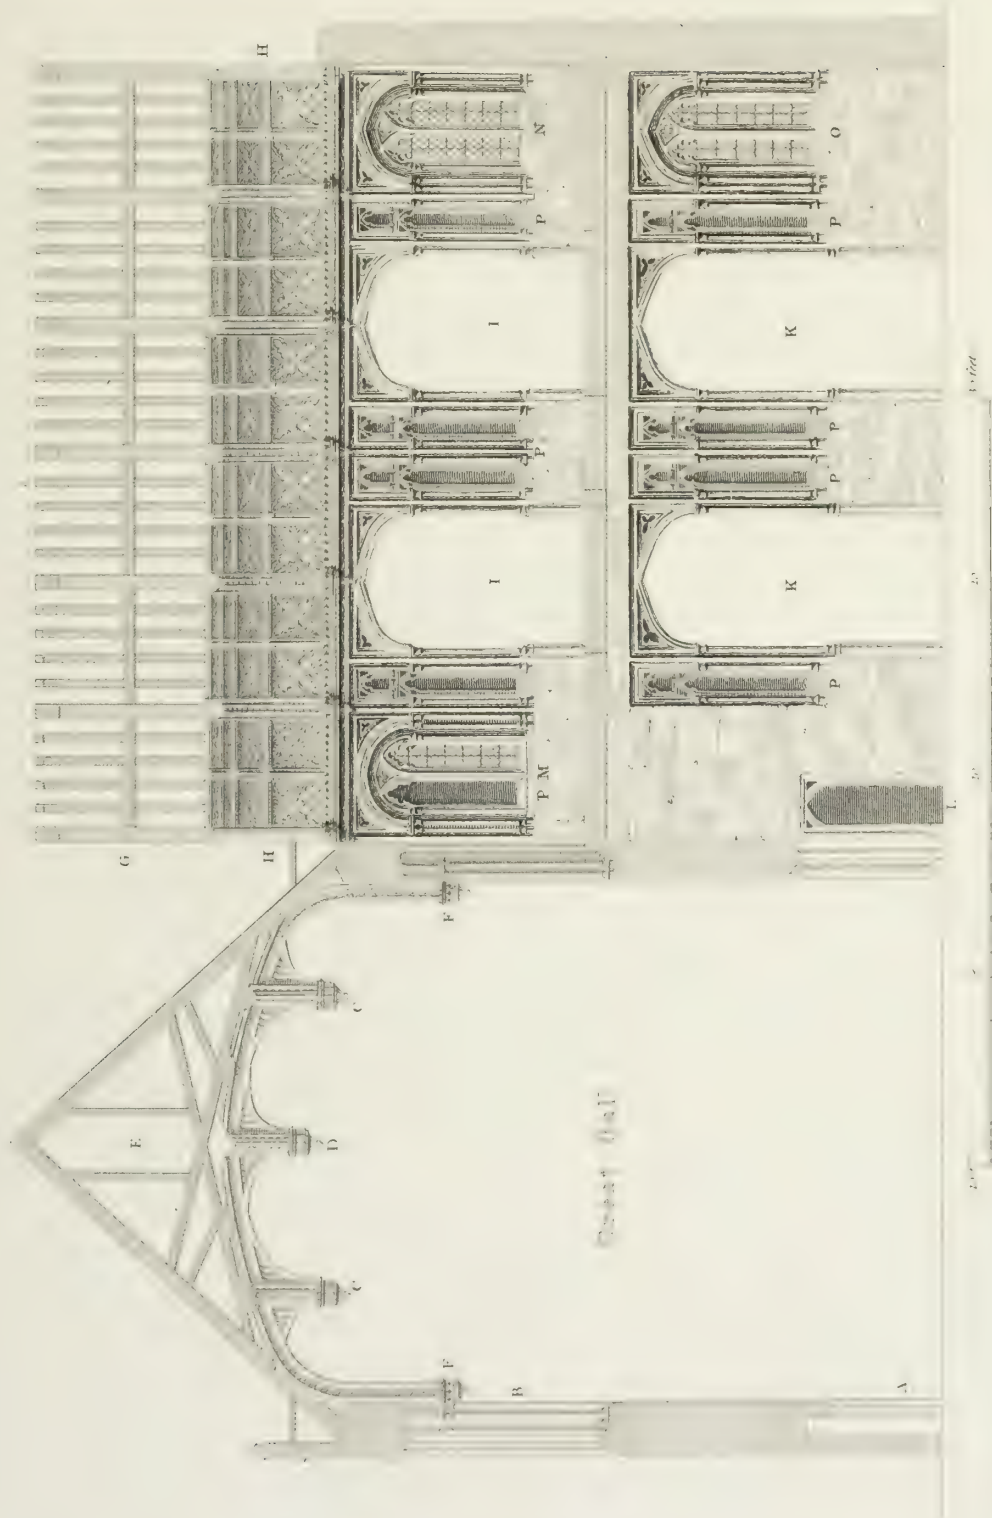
PLATE III. Elevation of east side of Great Hall, displaying the timbering of roof E. the fire-place A. windows B. inner roof with pendants c. c. blank side-wall D. This part was formerly covered with wainscot: at G. and H. the roof does not appear finished. The measurements are engraved on the plate.
